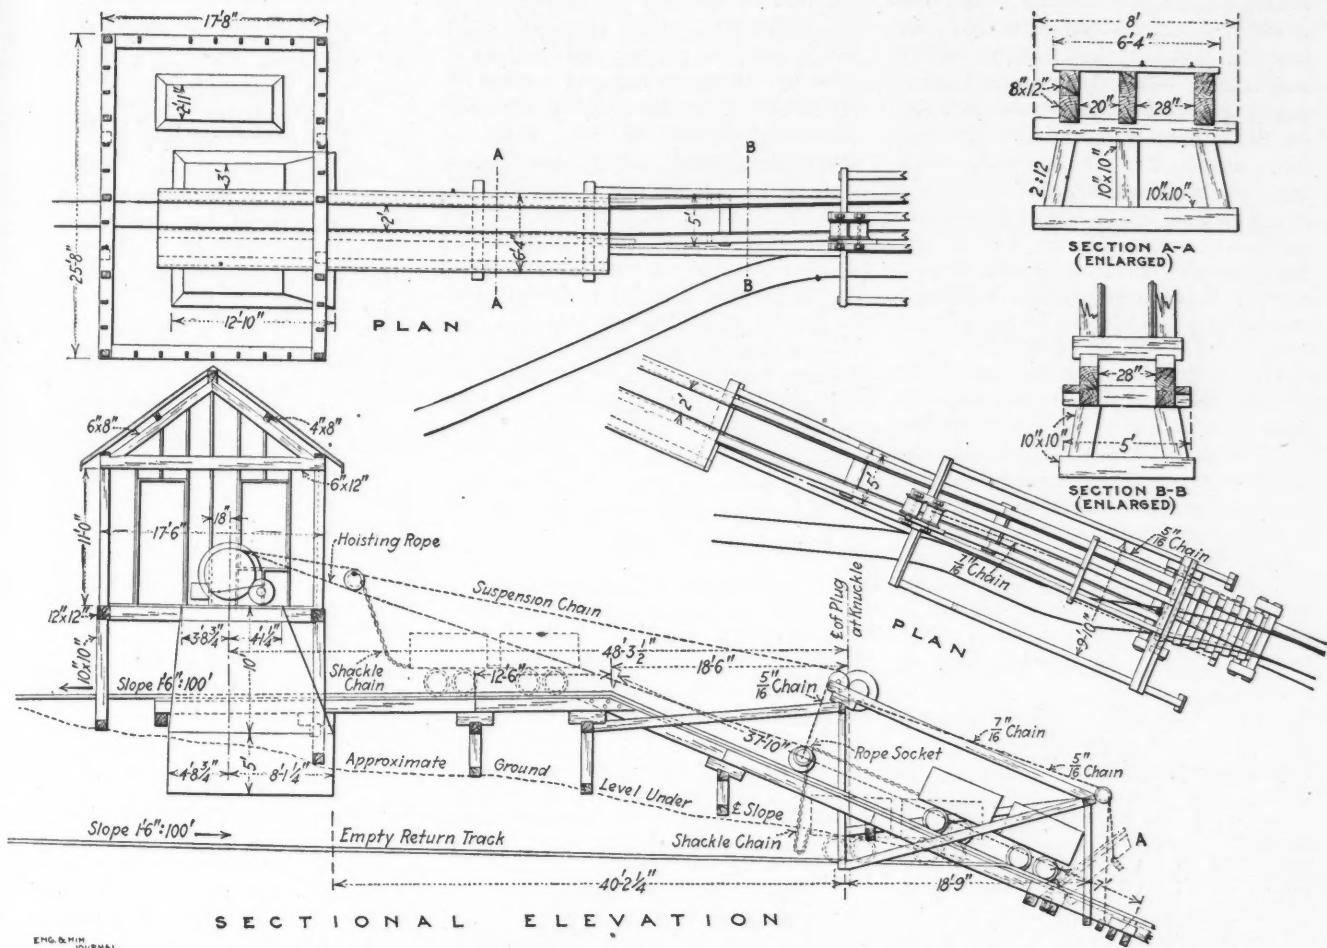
GENERAL ARRANGEMENT OF SLOPE, SHOWING ENGINE HOUSE, PULL BACK AND LOADED AND EMPTY TRACKS
